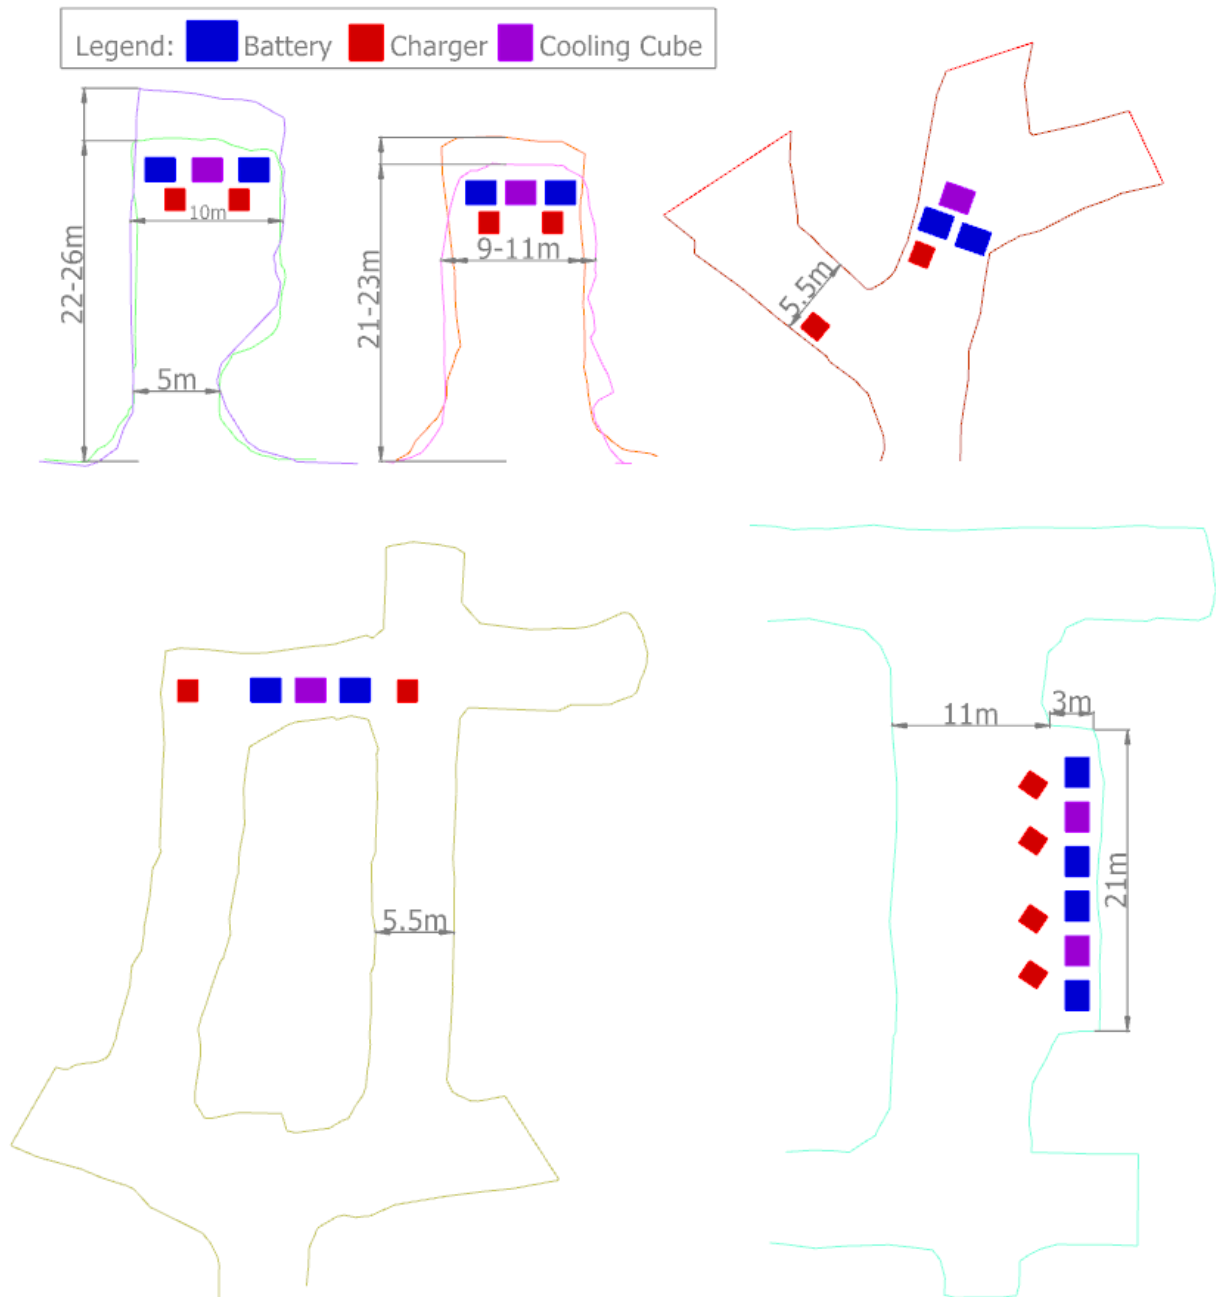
Actual Charge Bay Design Layouts (Plan View)
